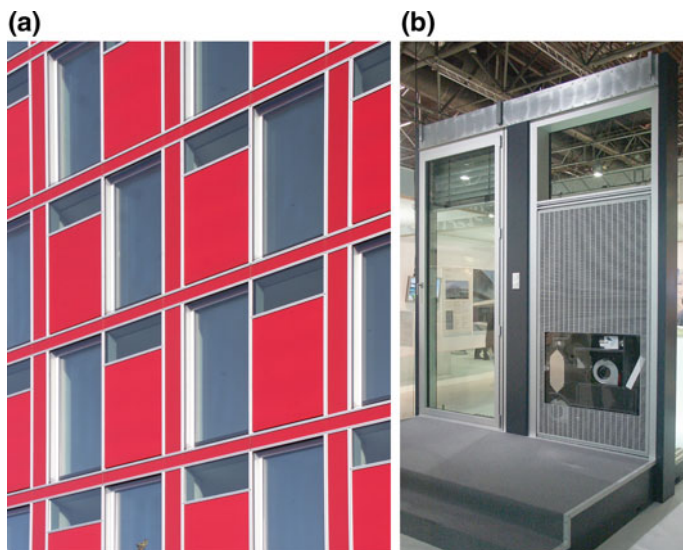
Capricorn Haus Façade (arch. Gatermann & Schossig, 2005). a View of the building's façade for the outside, b view of the façade module from the inside; see decentralized air-condition system installed in the façade module
